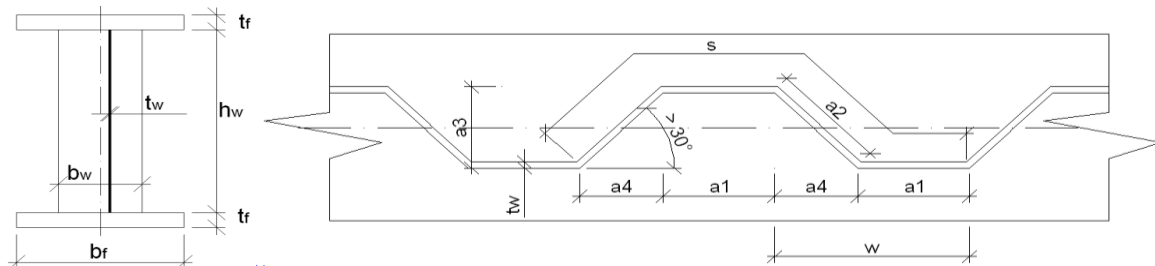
(l) transverse and (r) longitudinal cross section of plate girder with trapezoid web
